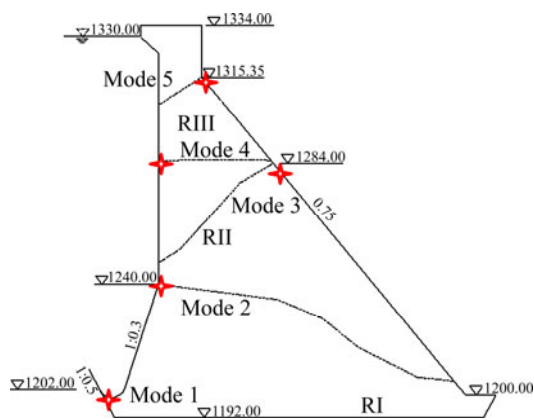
Potential failure modes under earthquake loading (Unit: m)
